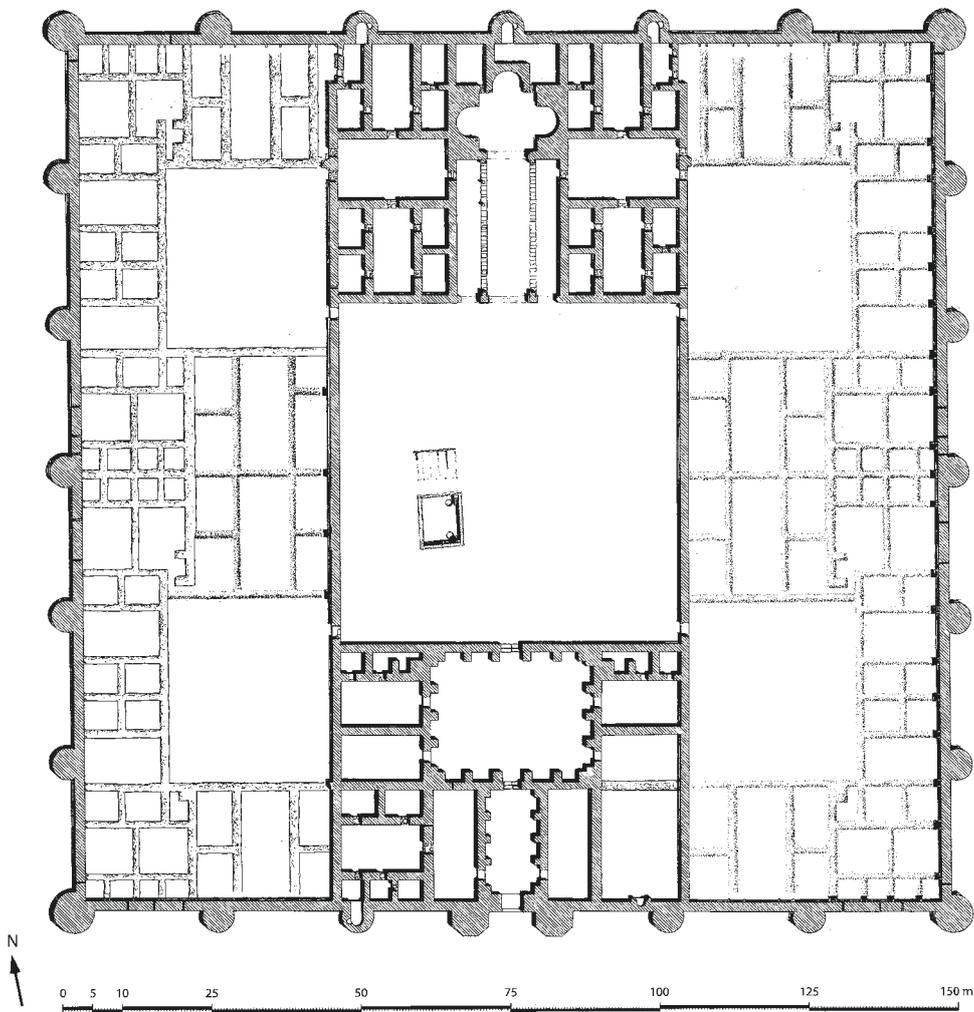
Mshattā, residence, ground plan, partly reconstructed. – (After Cramer/Perlich/Schauerte, *Mschatta*, folding plan after p. 440).
